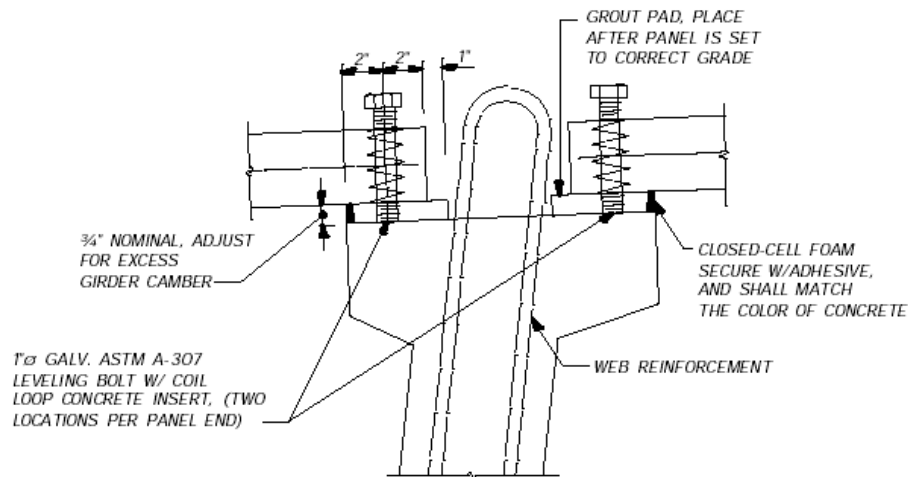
Typical detail for panels bearing on a concrete tub girder (from WSDOT standard bridge drawings)
